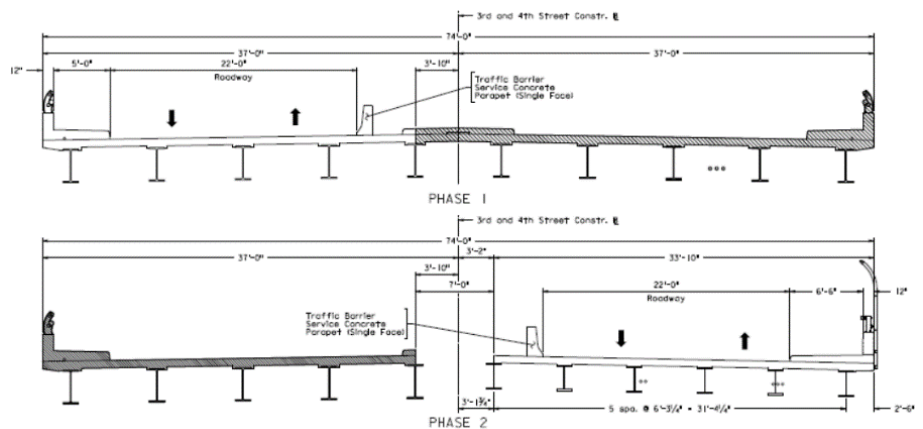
4<sup>th</sup> Street Bridge Phasing
